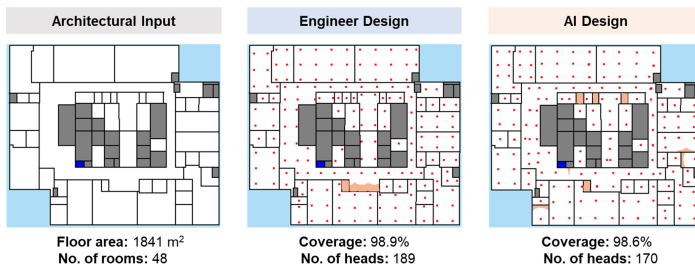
AI-generated fire sprinkler layout drawing.
